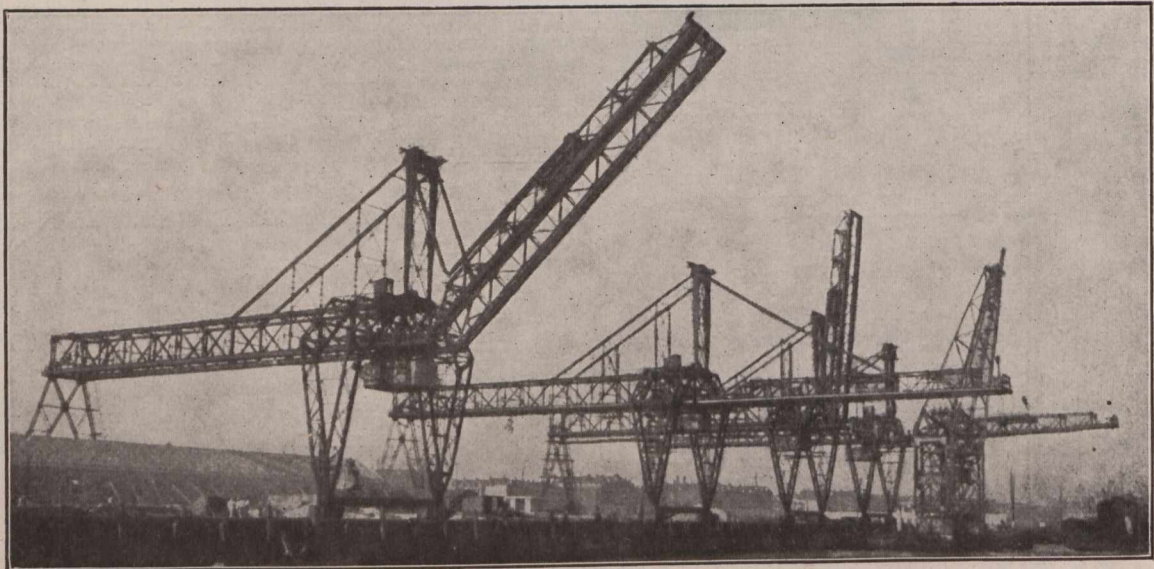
Loading Plant with Bridges of 160 ft. Span and 90 ft. Cantilever.
